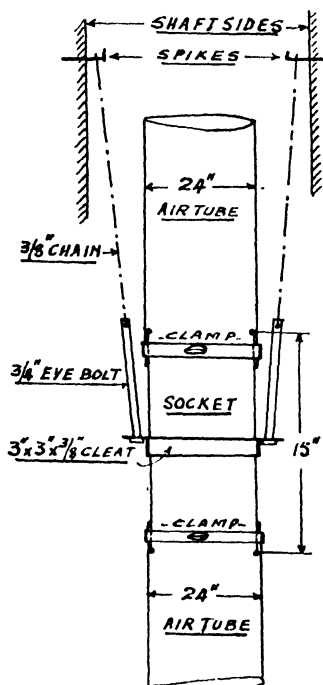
Securing Ventilating Pipes in a Sinking Pit.
